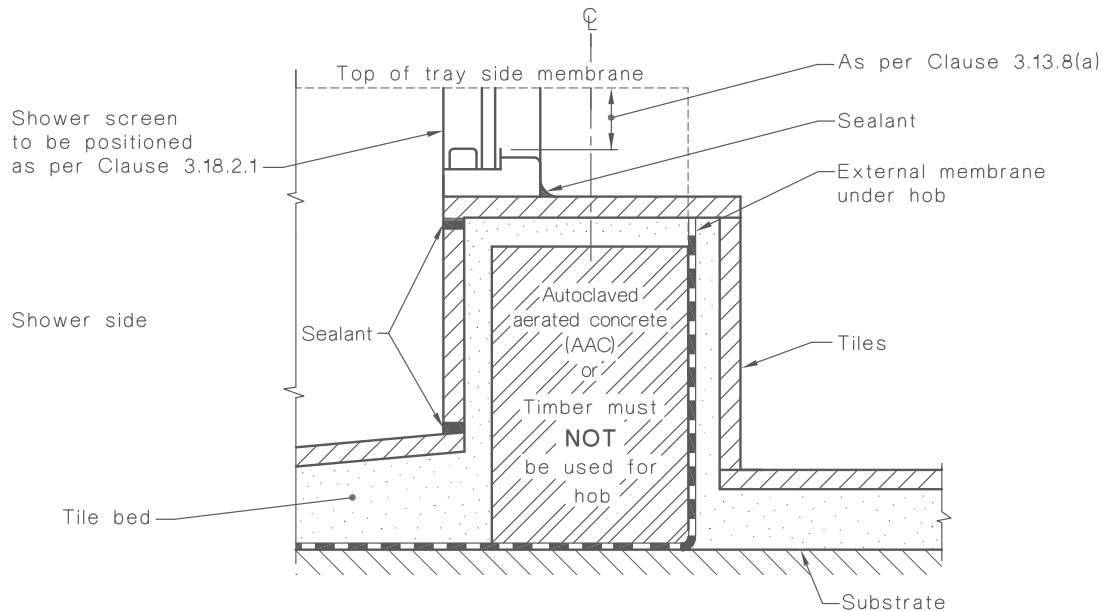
TYPICAL HOB CONSTRUCTION—EXTERNAL (PREFORMED) MEMBRANE
